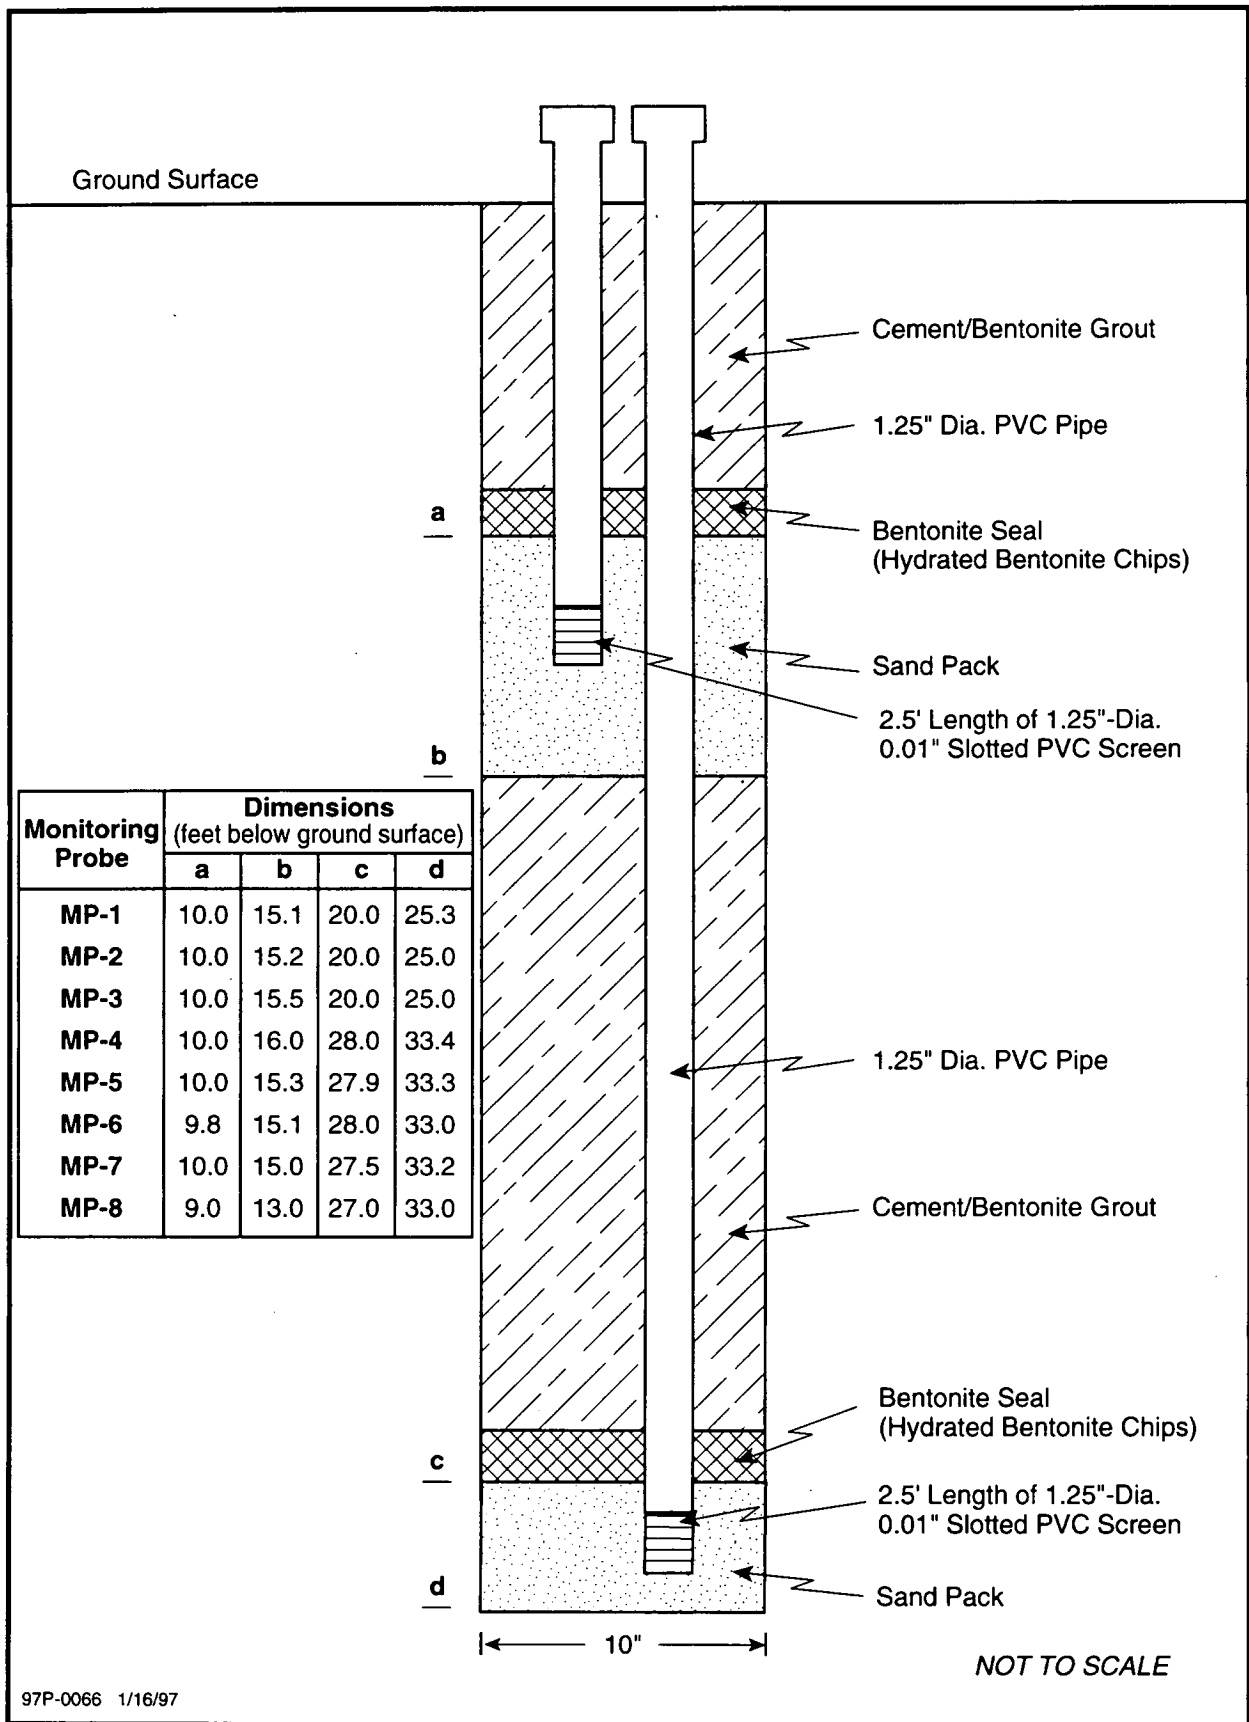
CONSTRUCTION DETAILS OF NESTED PRESSURE MONITORING PROBES
